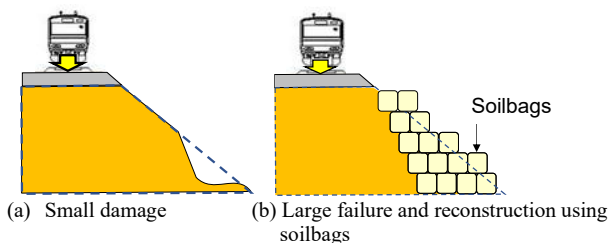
Illustration of scale of damage of railway embankment due to rainfall.
